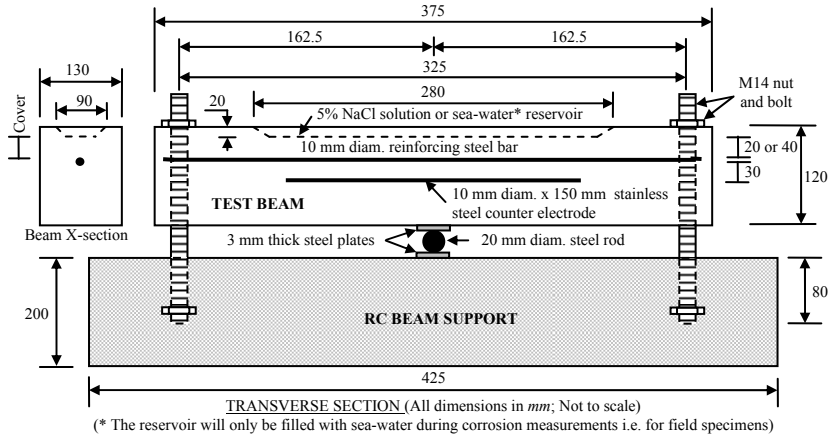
Beam loading set-up for 0.4 and 0.7 mm cracked specimens
